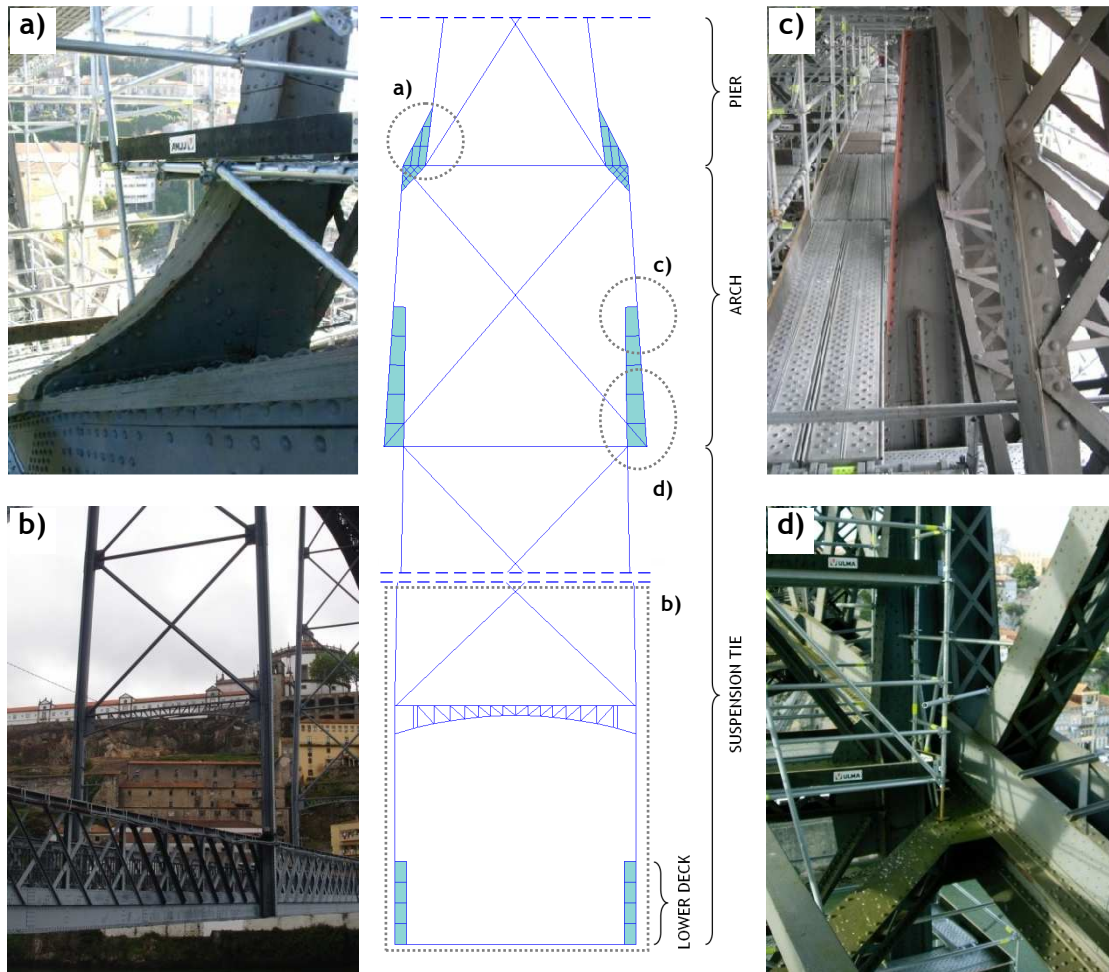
Modeling of the bridge in the alignments M1 and M4: (a) detail of the footing of pier M4; (b) support provided by the suspension tie M4 to the lower deck; (c) connection of the suspension tie M4 to the arch vertical; (d) detail of the arch joint where the suspension tie M1 connects to the arch vertical.
